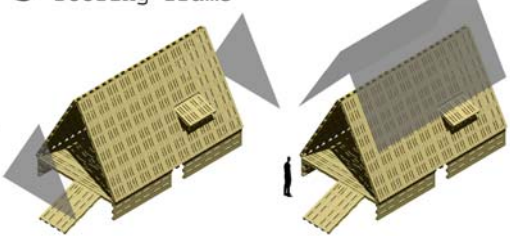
Illustration of TPH©'s building process by using based-panels consisting of twin-pallets module. It is applied in floor and equilateral pitched roofs. Source: Suau - Teixido.
